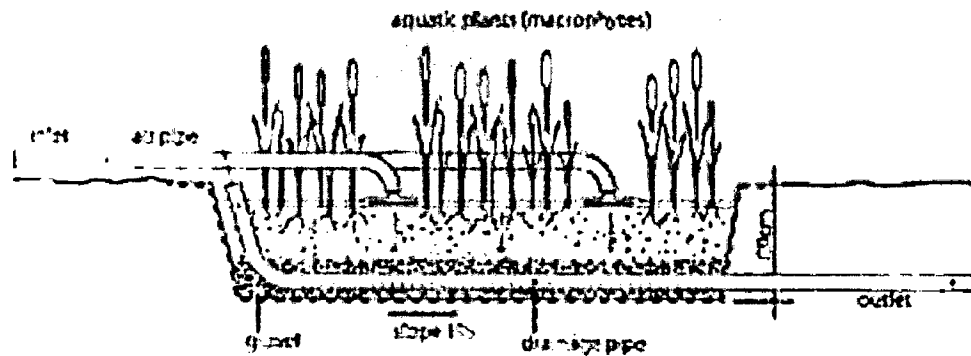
(b): Subsurface vertical flow system (Tilley et al., 2008)
